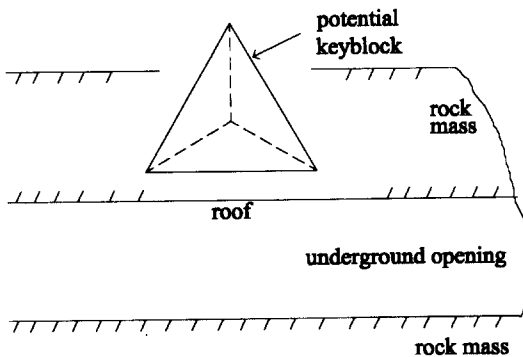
Configuration of potential keyblock in the roof of underground excavation
